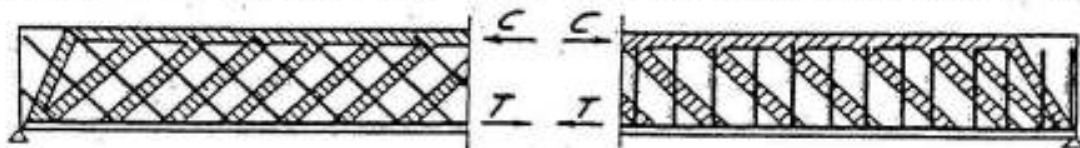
Action of a simple reinforced concrete beam as a complex truss
